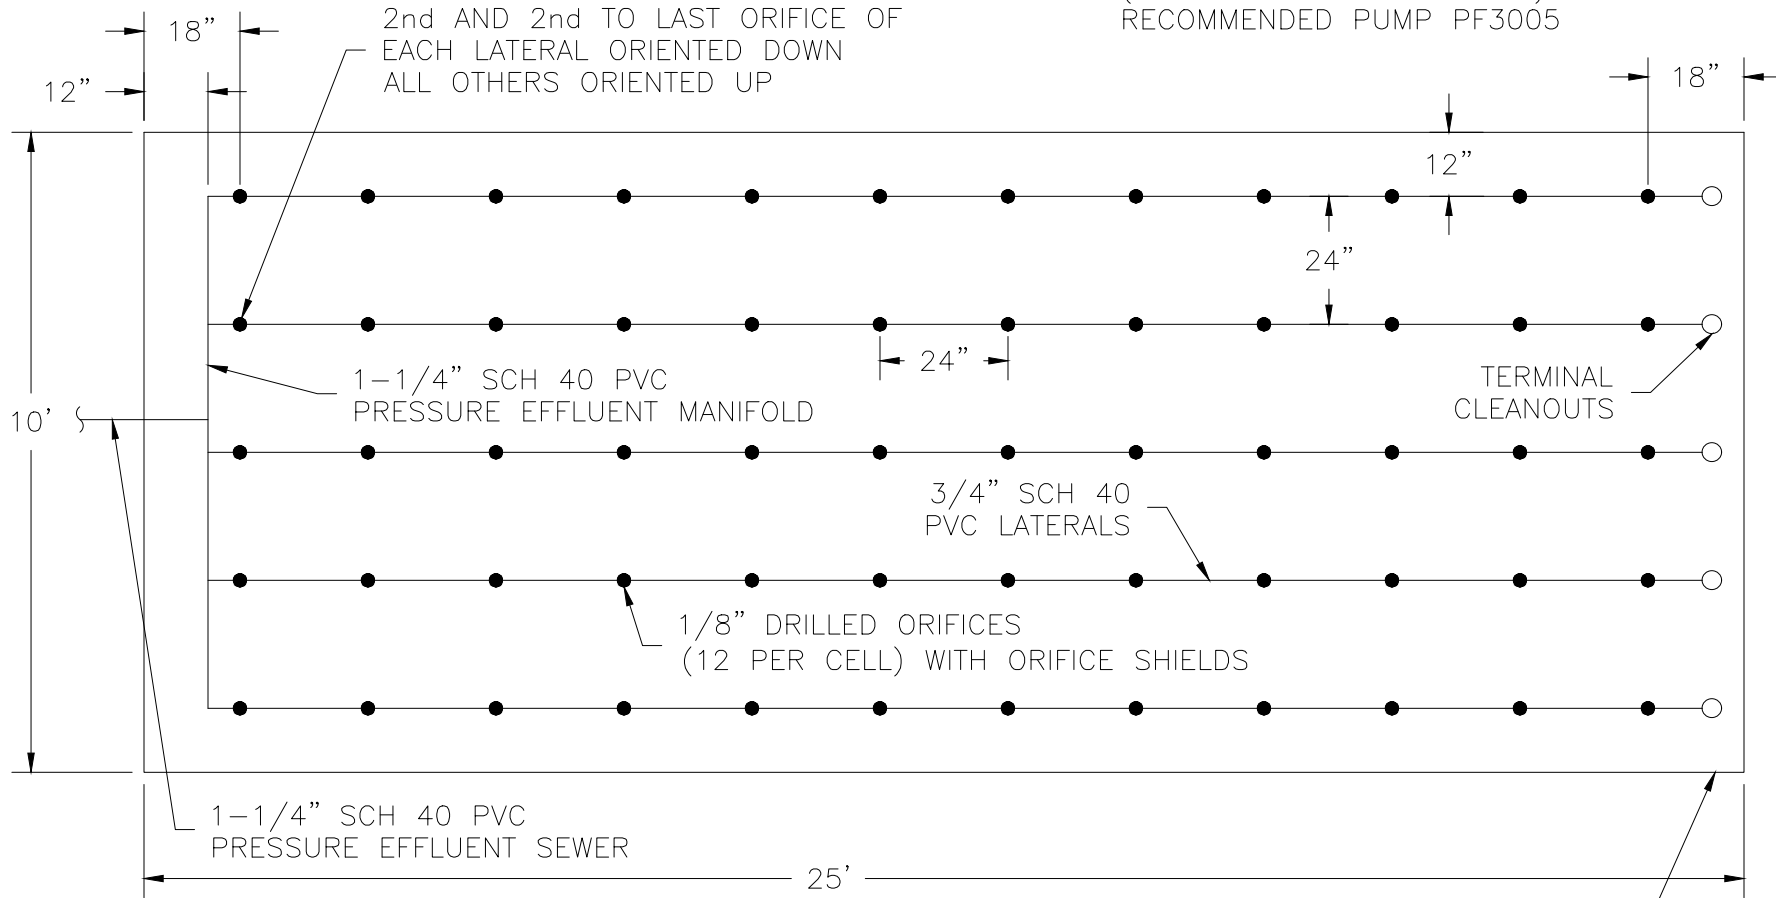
B. Modified Bottomless Sand Filter Section – Replacement
